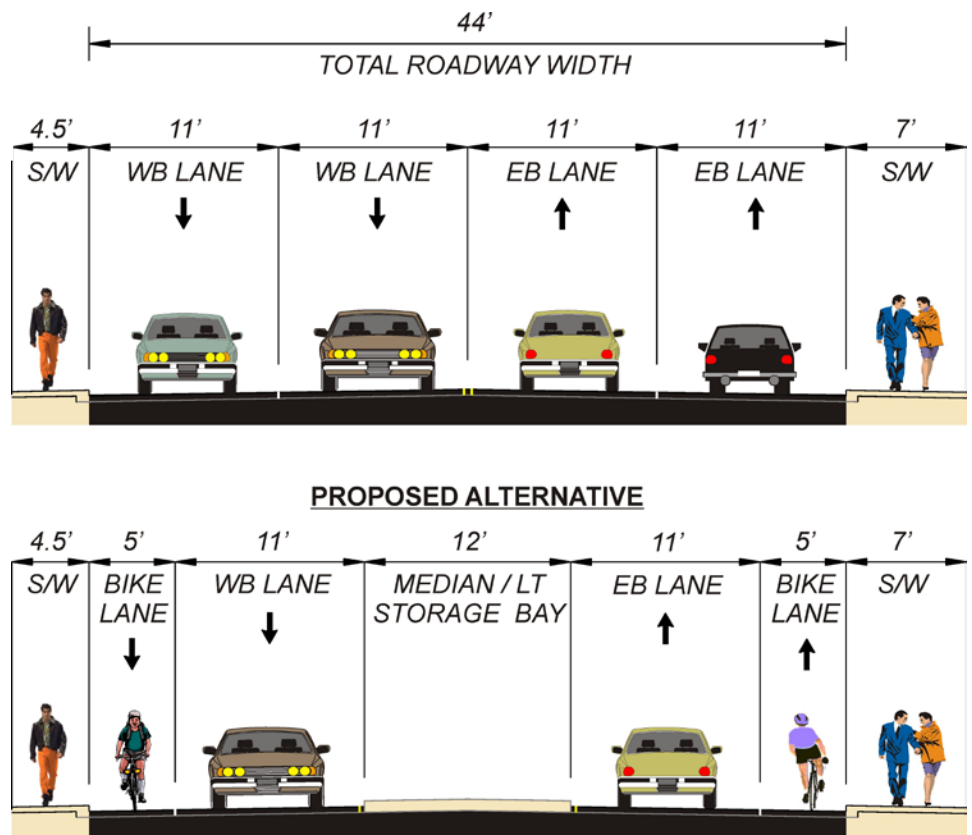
S. College Avenue – Gateway and Traffic Calming
